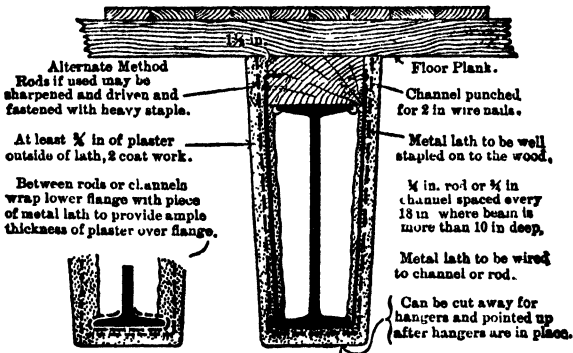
Fireproofing of Steel Beam with Metal-lath and Plaster
